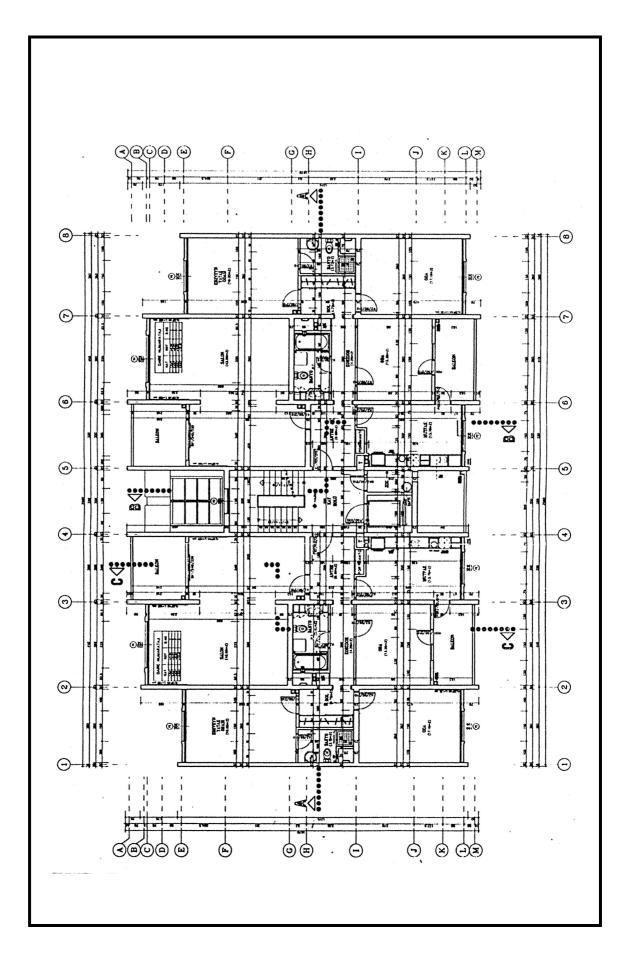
Mavişehir II; C Apartment Building 1st – 4th Floor Plan
